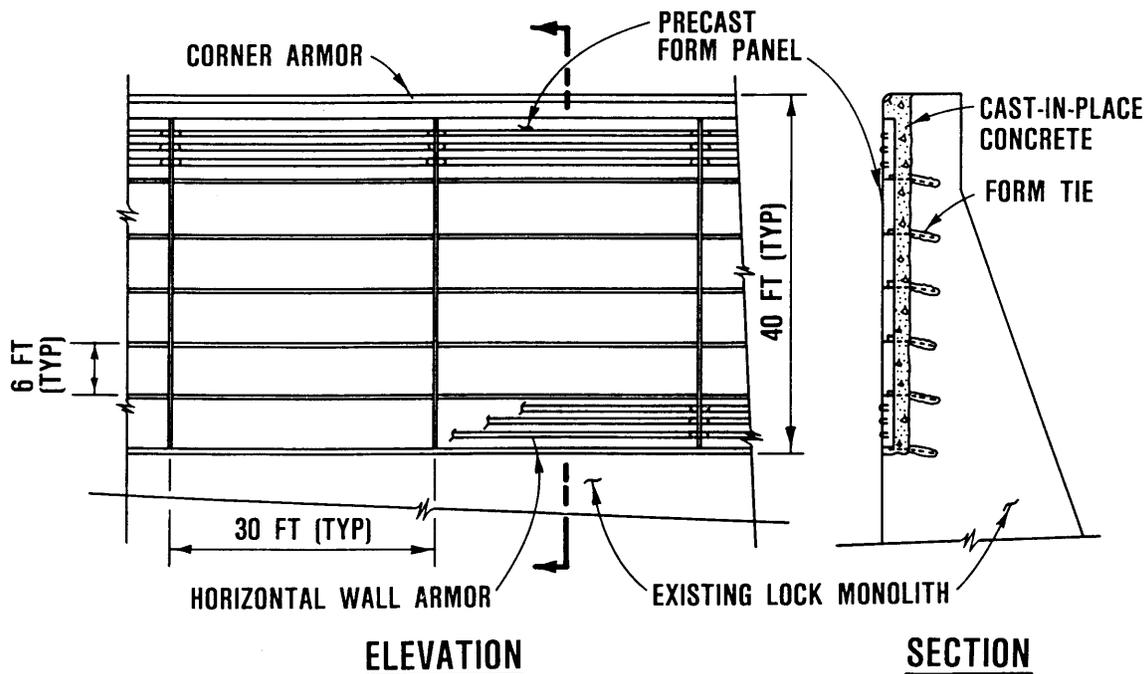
Precast concrete stay-in-place forming system for lock wall rehabilitation.
